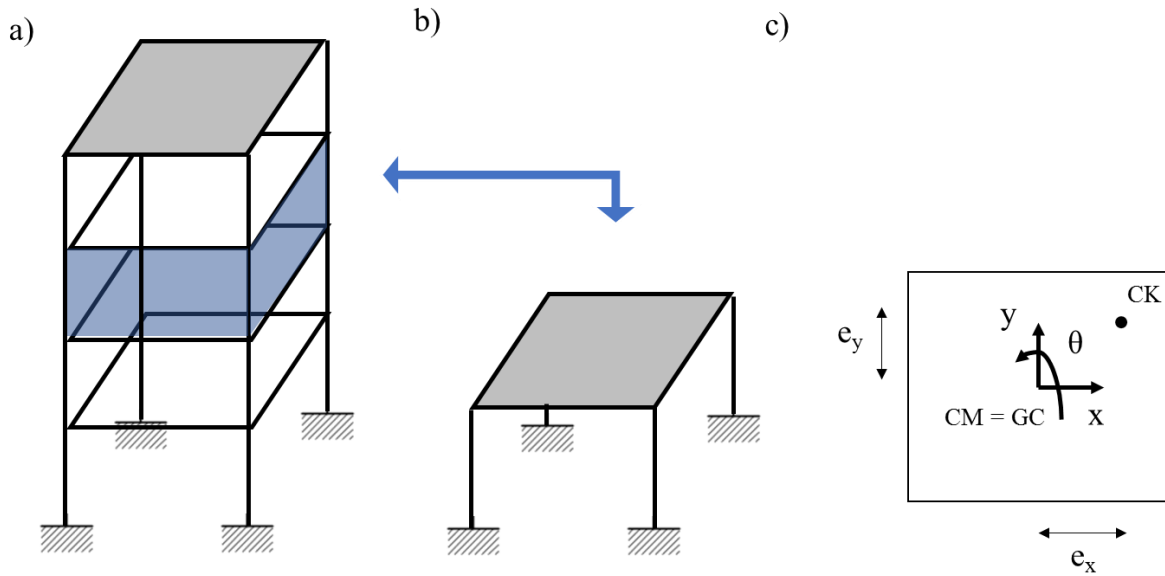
Building models: a)  $n$ -story shear-type building model; b) 1-story shear-type building model; c) plan view of the structure.
